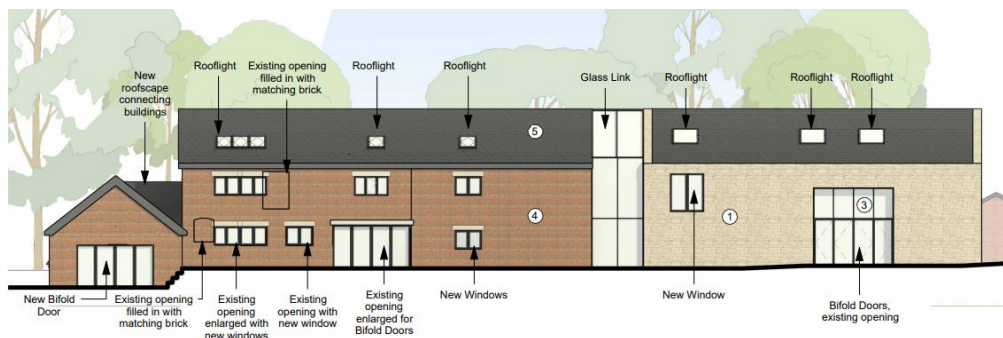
Plot 1 Proposed Rear (N) Elevation
